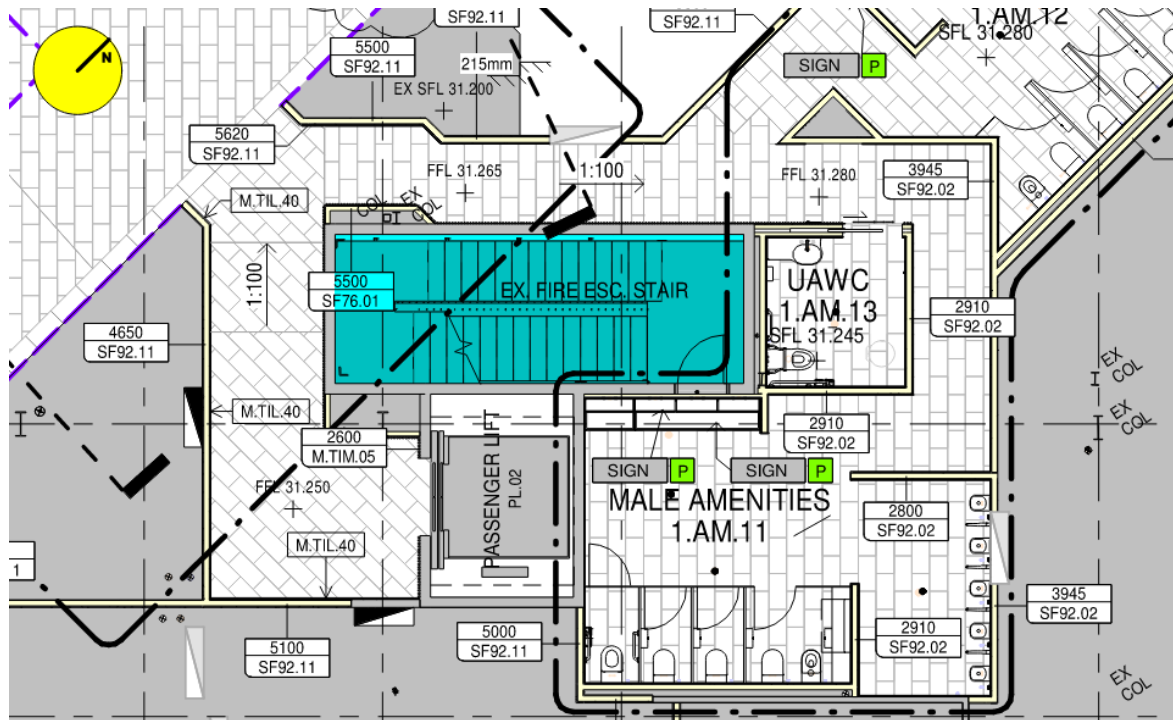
Existing stair north of passenger lift PL.02 – First Floor
